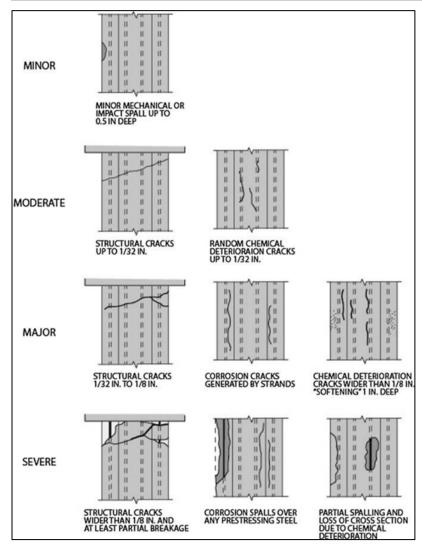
Damage Ratings Sketches for Prestressed Concrete Elements
